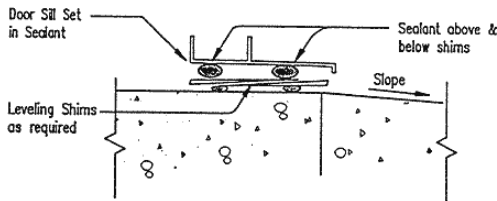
Concrete or Wood Sub-Floor with Shims
